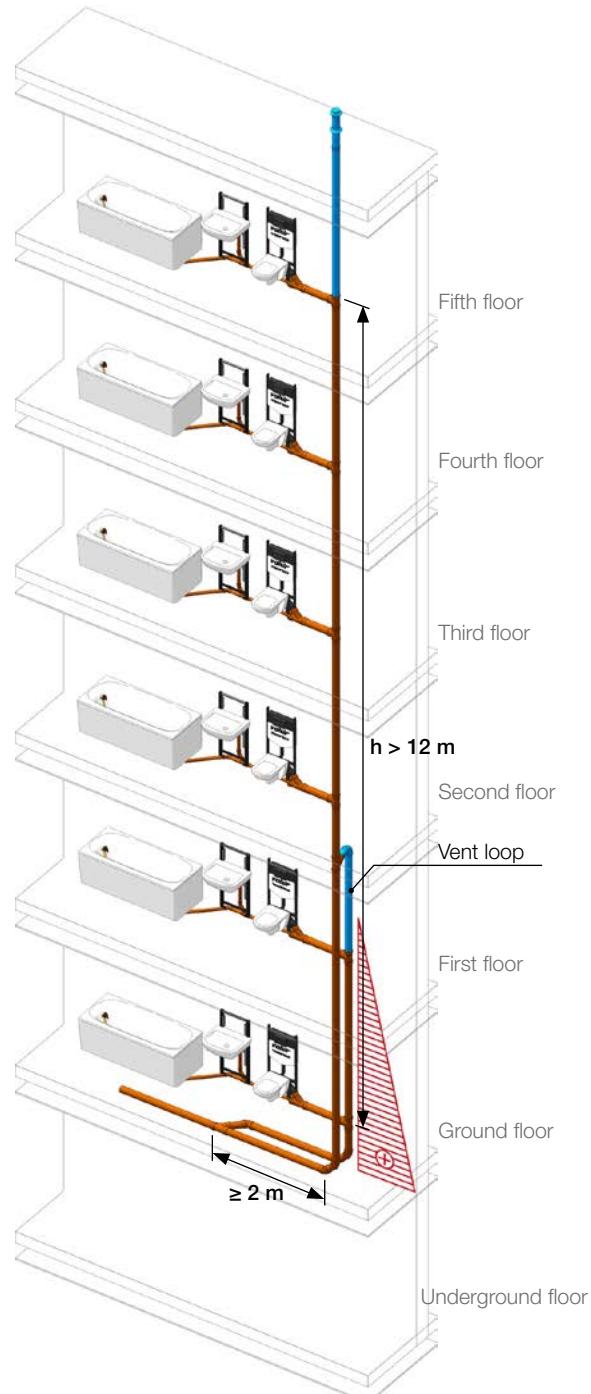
Primary ventilation, building over 5 storeys high ($h > 12 \text{ m}$), collector in the ceiling of the underground floor.
